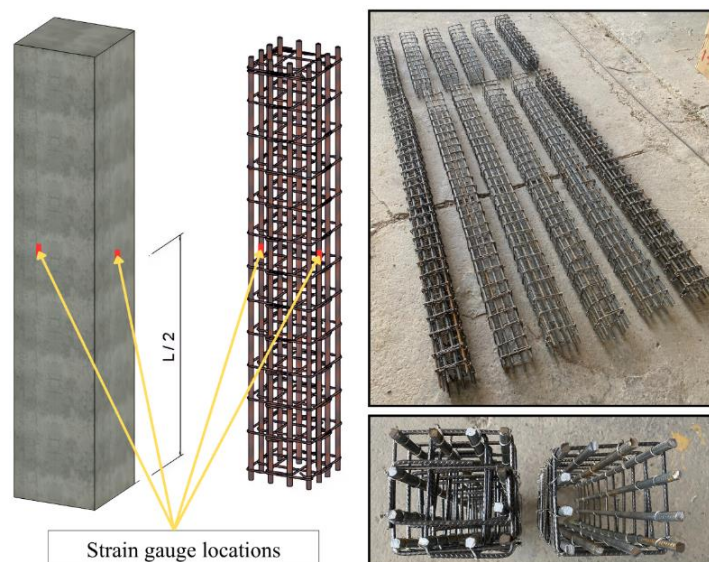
Steel reinforcement arrangement and strain gauge locations for concrete and steel reinforcement (where L is the column length)
